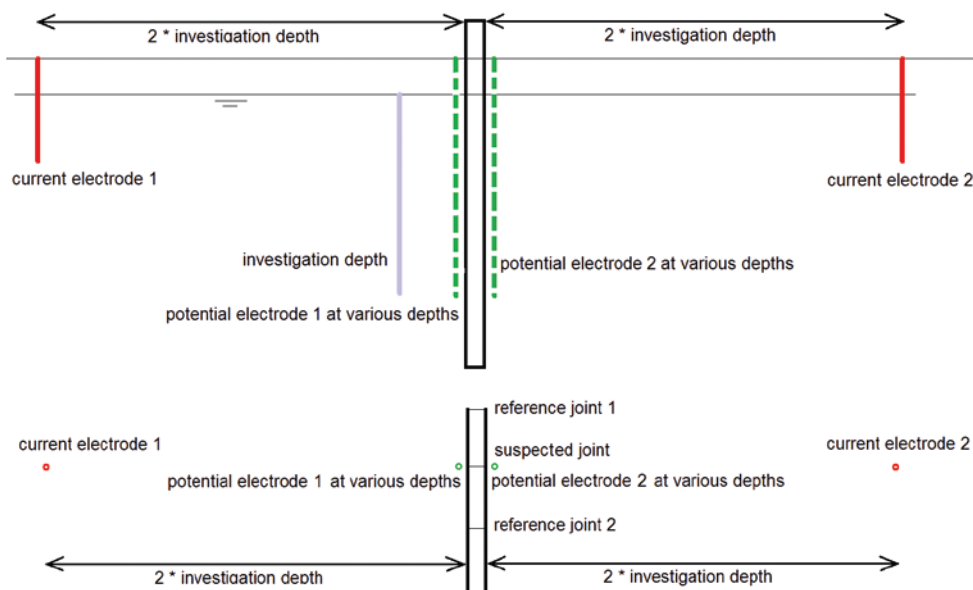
Suggested measurement setup for testing a diaphragm wall before excavation of a building pit (side view).
